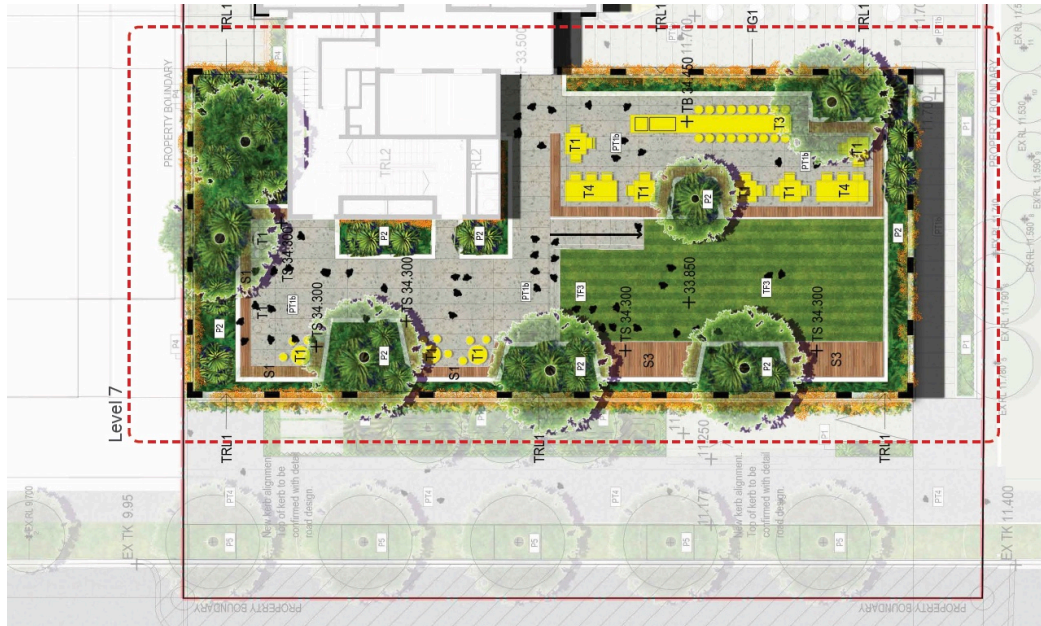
Revised Landscape treatment to the western facade of the communal rooftop on John Street (Page 21 of 37, Version D)
